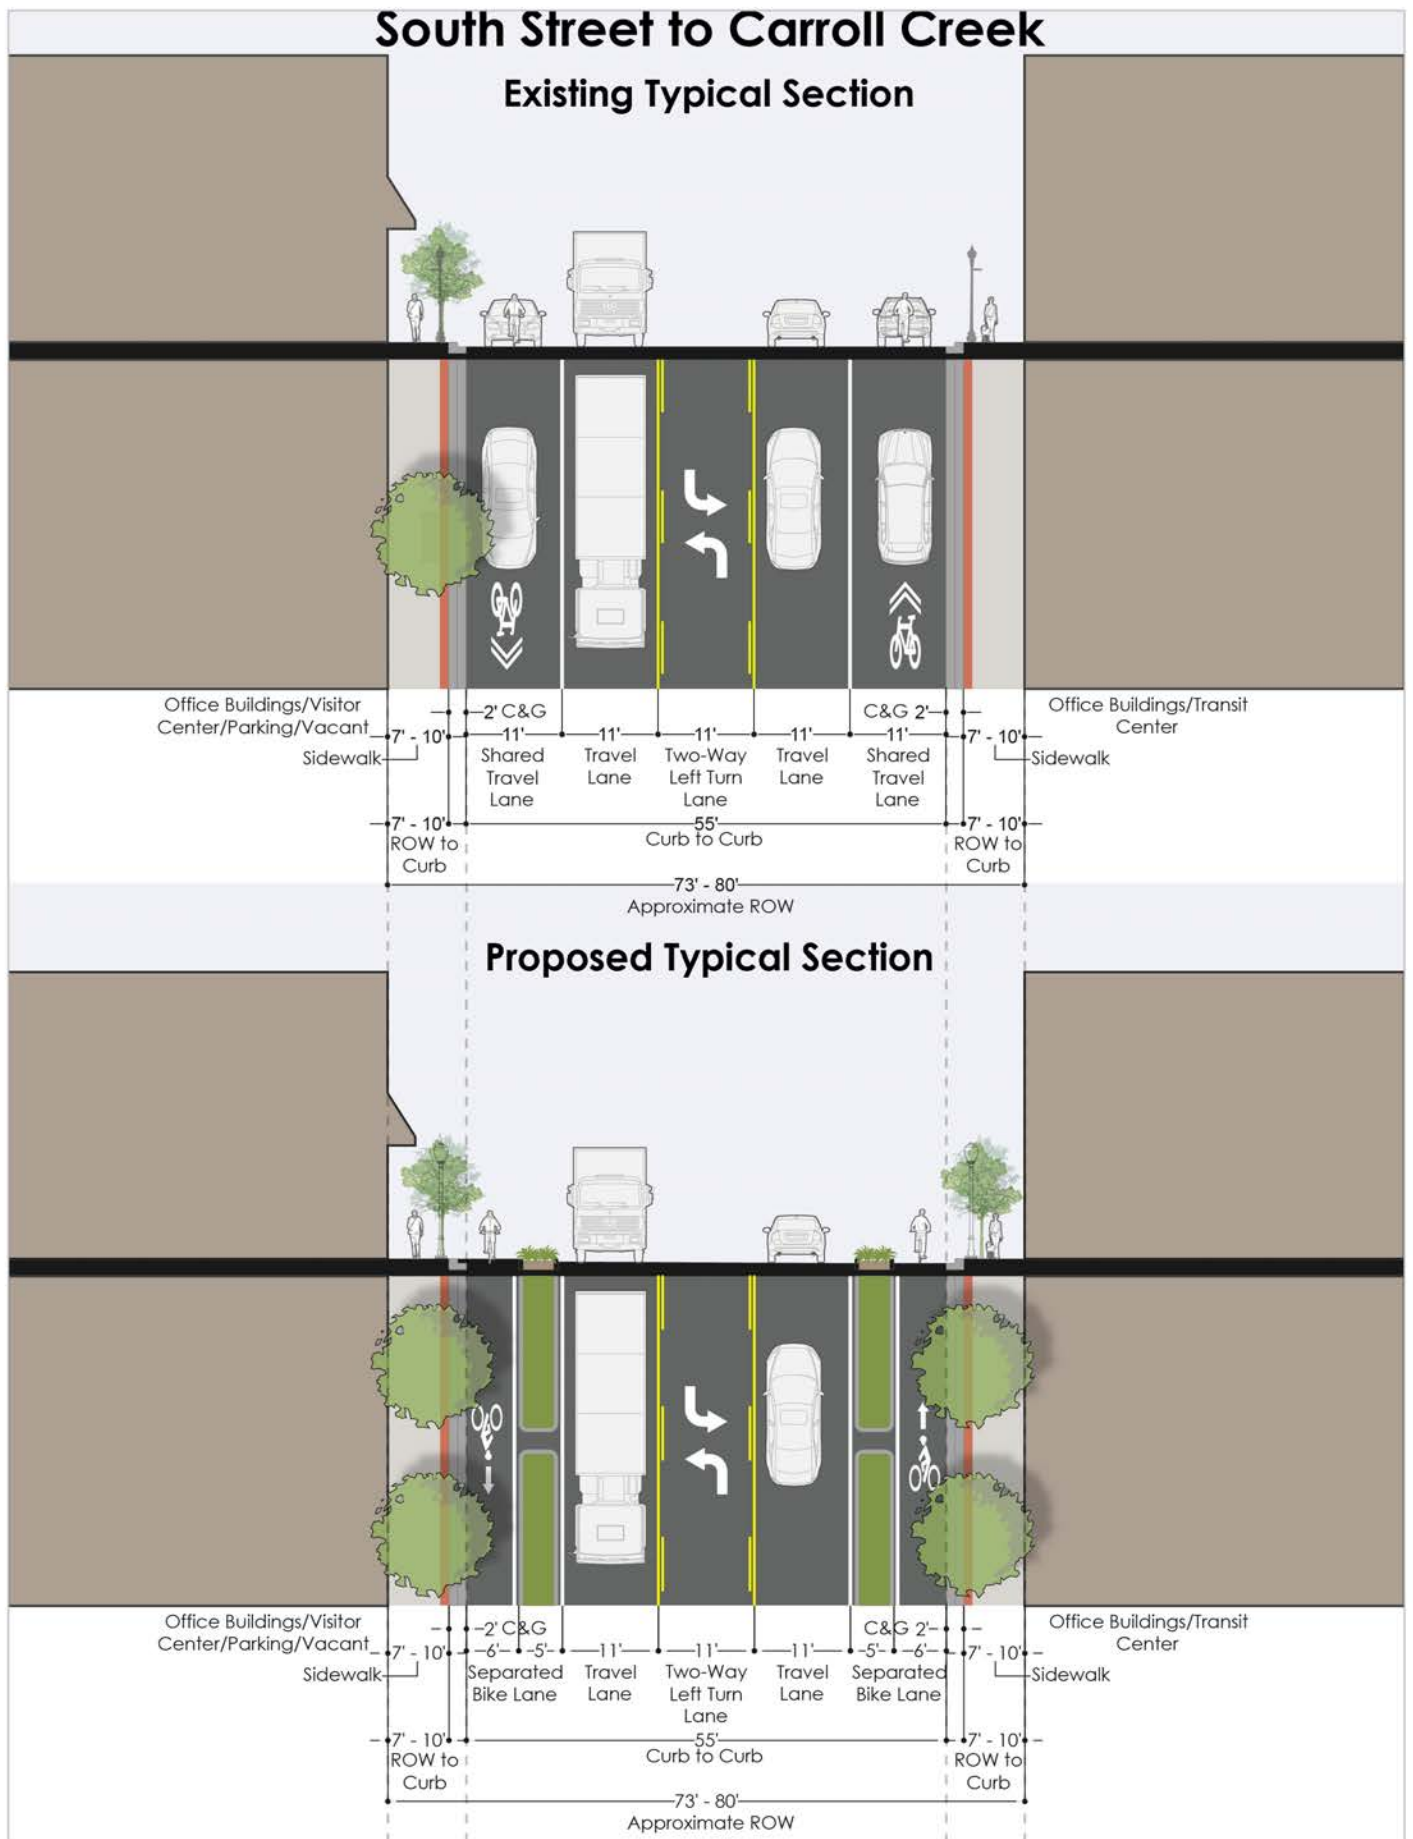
Existing and Proposed Typical Section - South Street to Carroll Creek
